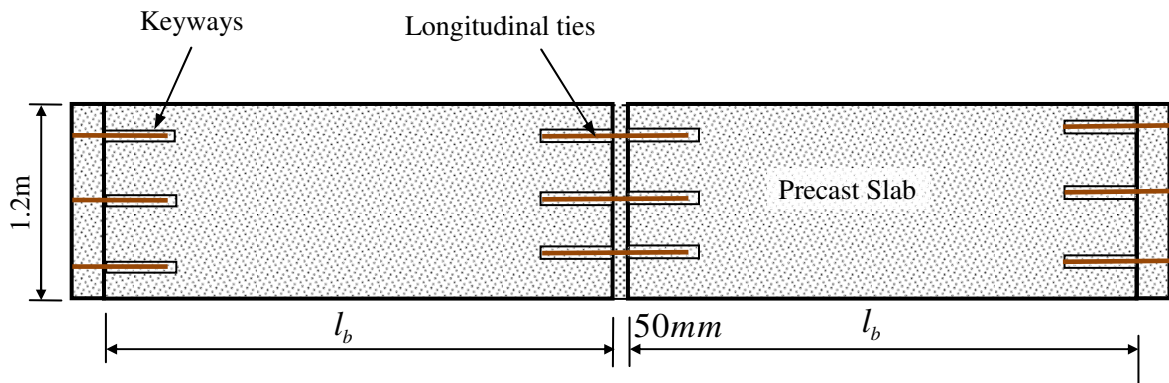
Floor-to-floor system facilitated by longitudinal ties.
